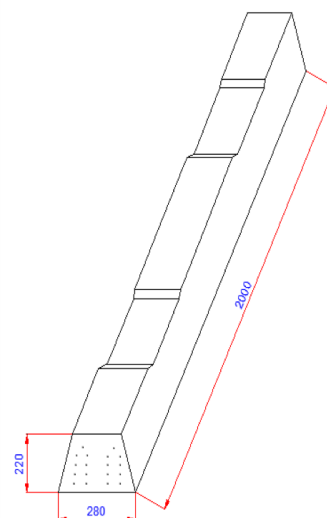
Isometric Sketch of Prestressed Monoblock Concrete Sleeper
